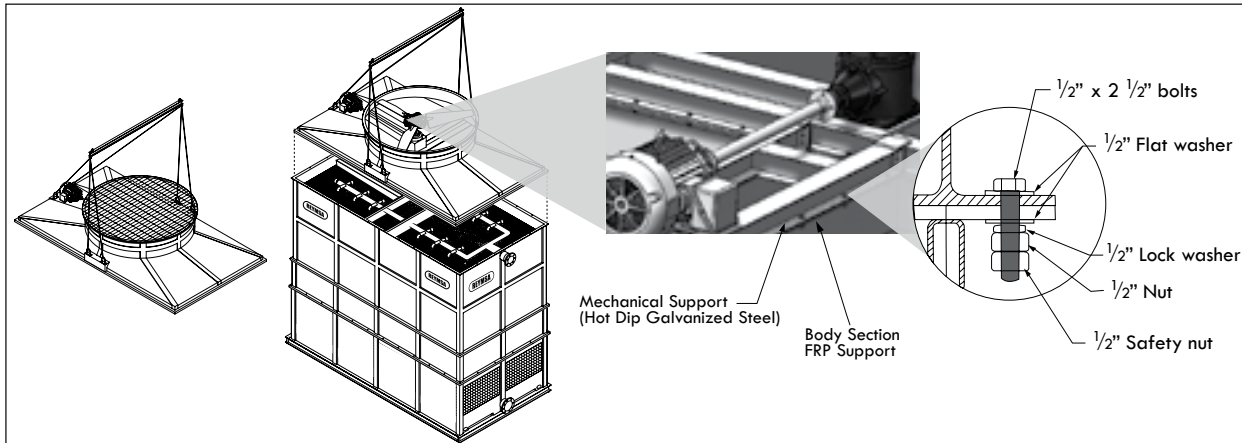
Fan Deck installation of an RTGM or an RTGMTC Tower with motor installed outside the airstream.
